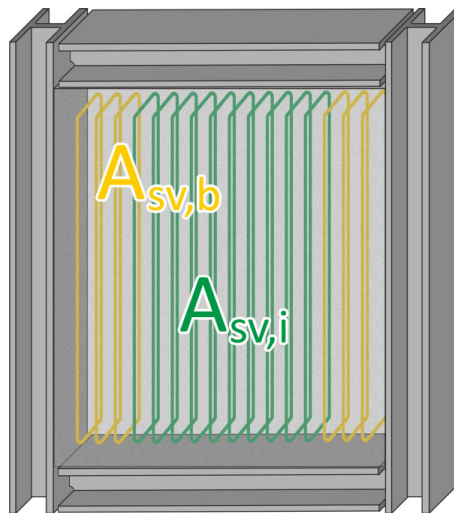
BENDING AND VERTICAL SHEAR REINFORCEMENT OF THE WALL
